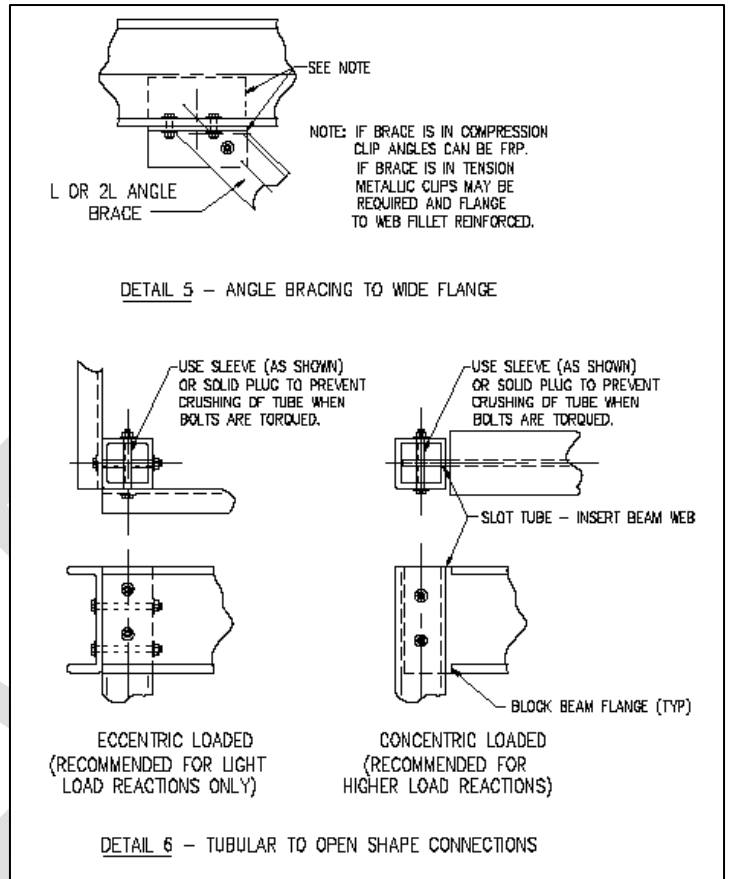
PULTRUDED FRP STRUCTURAL CONNECTIONS
